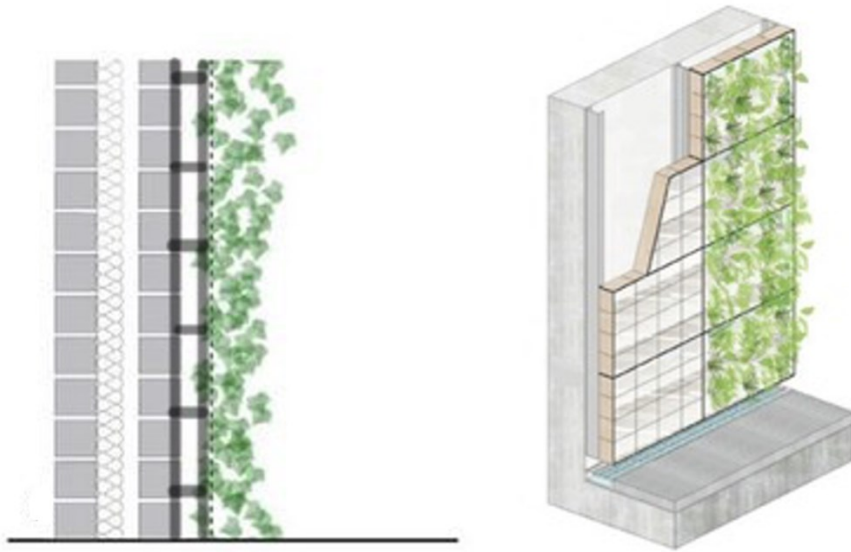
Structure of Modular green façades. Source [8], [9]
